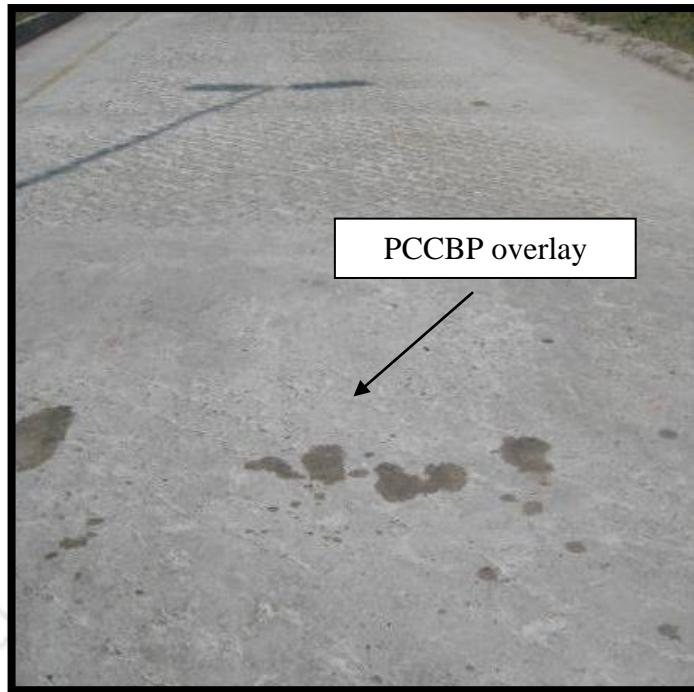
Surface condition of 50 mm thick PCCBP overlay lay over 445 mm thick existing bituminous pavement.
